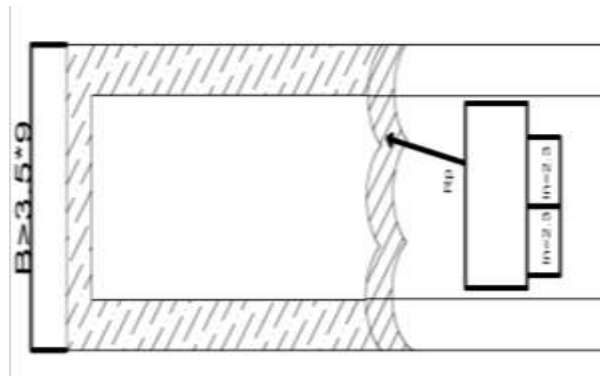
Diagram of excavator pass “backhoe” during pit or trench excavation: across the pit or trench.
